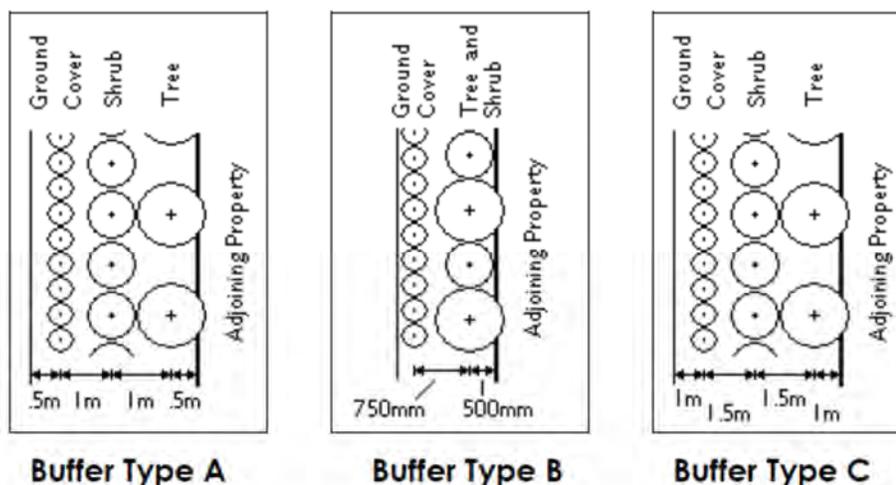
Suggested planting layouts for buffers
